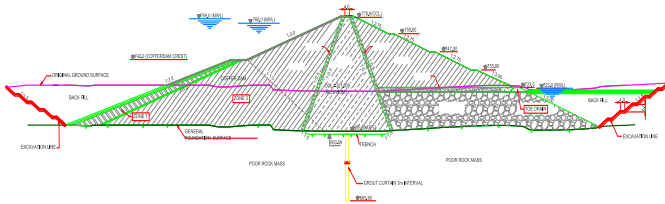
Dam geometry at its maximum Section (Chainage 0+180) (Source: WWDSE, 2016)
